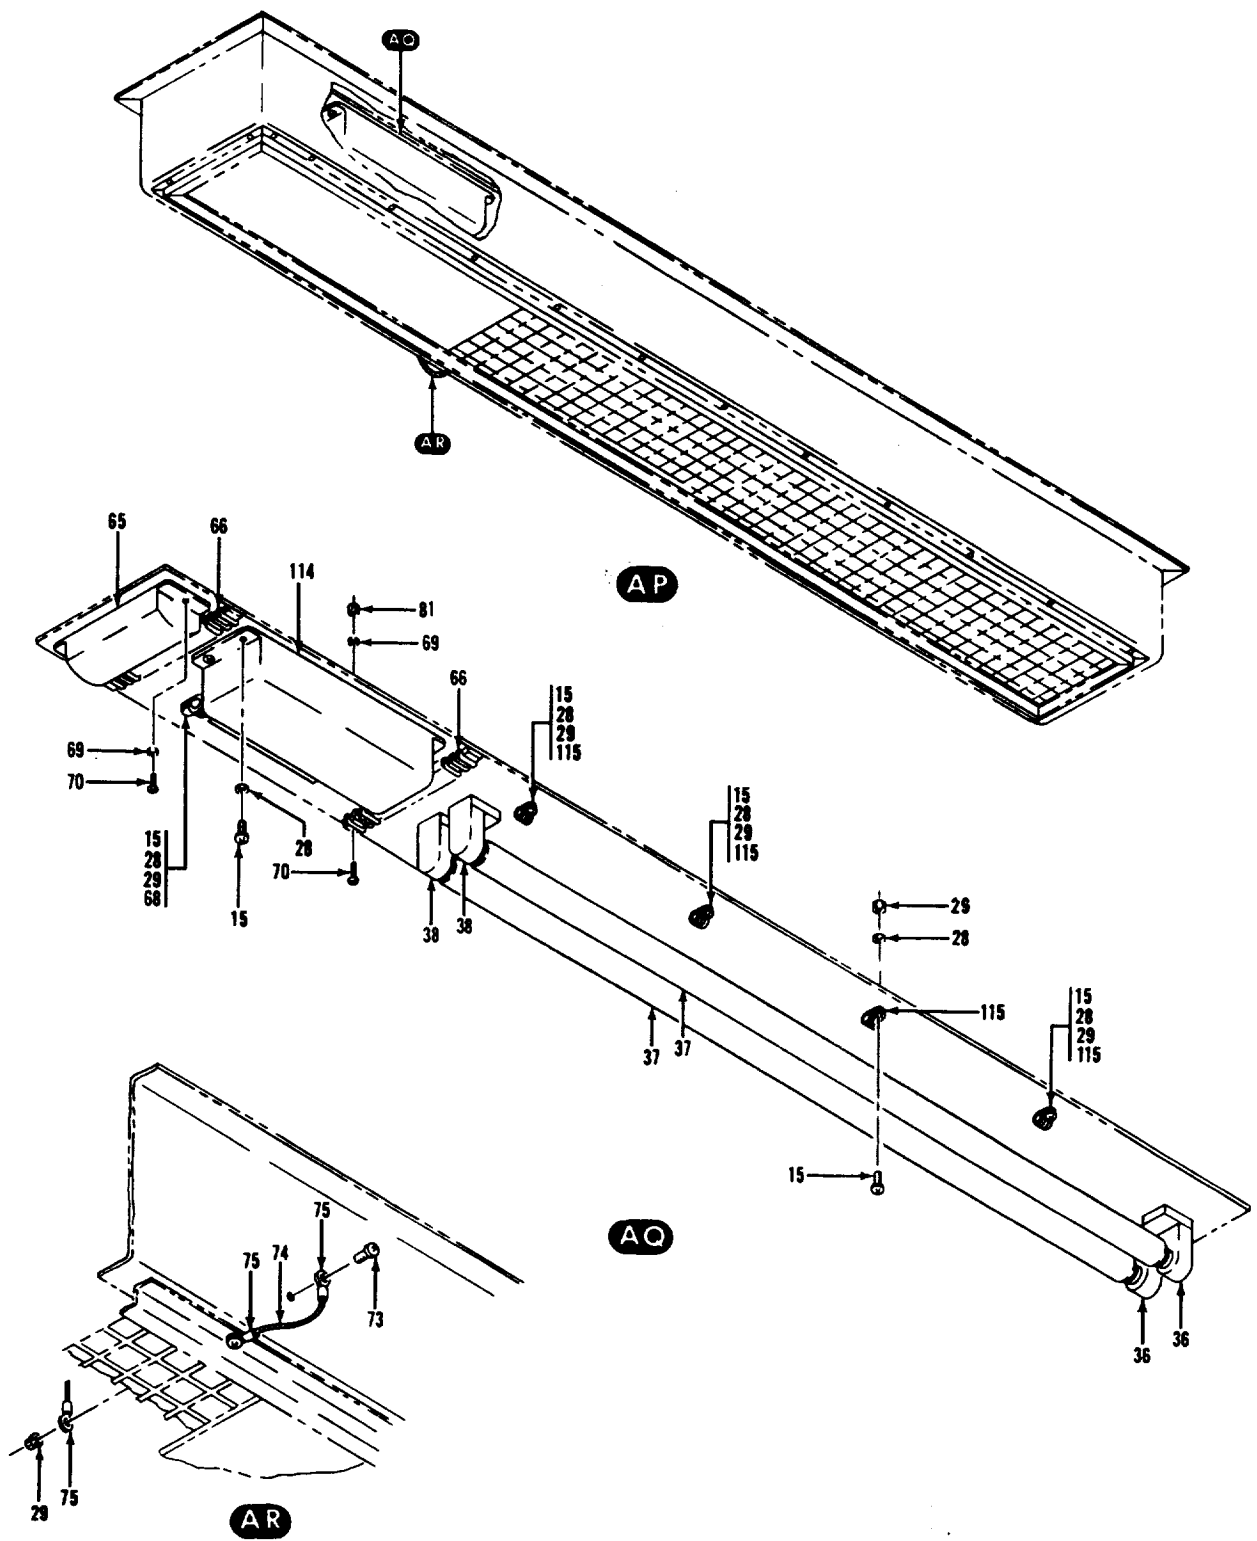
Electrical Equipment Installation (Sheet 13 of 19)
